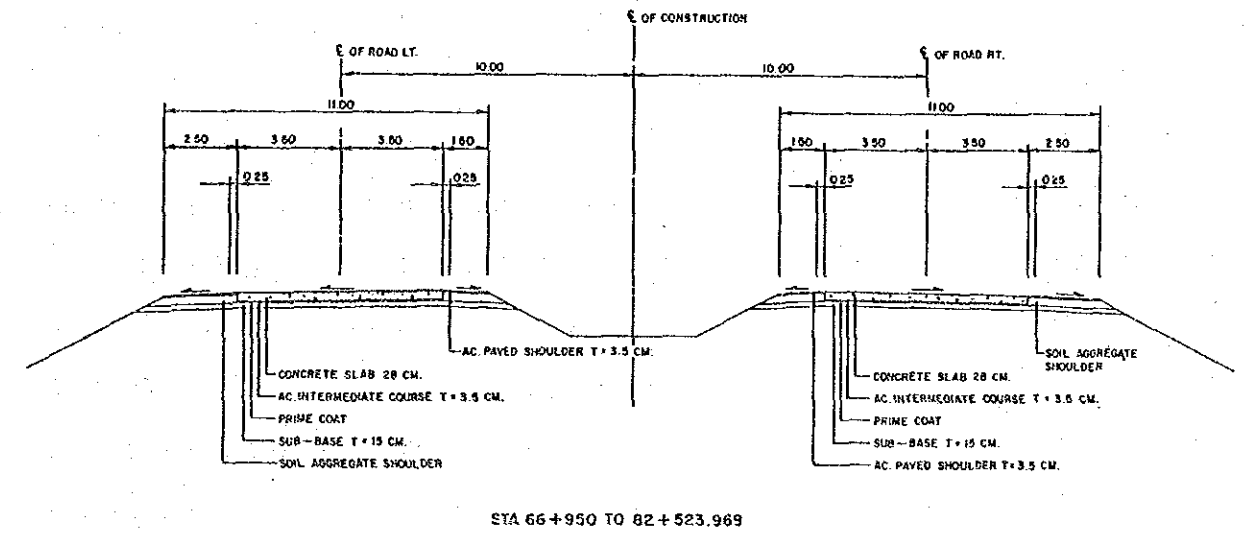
FIGURE TYPICAL PAVEMENT STRUCTURE FOR RIGID PAVEMENT ML-9.3
